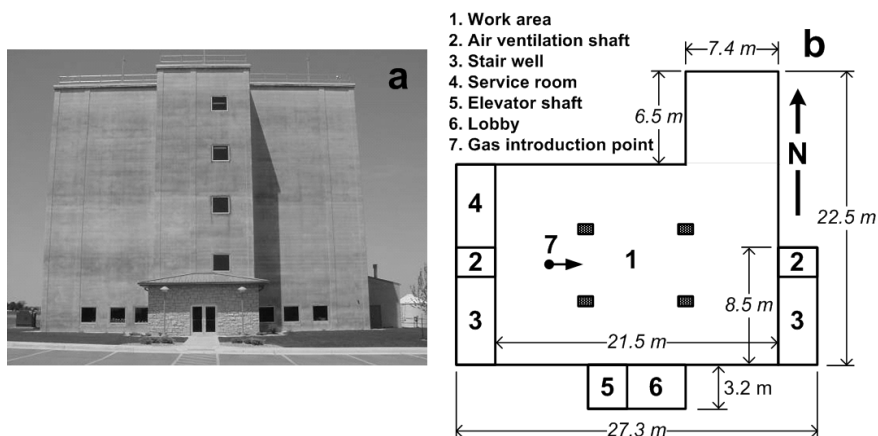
(a) The Hal Ross Flour Mill and (b) its floor plan.
